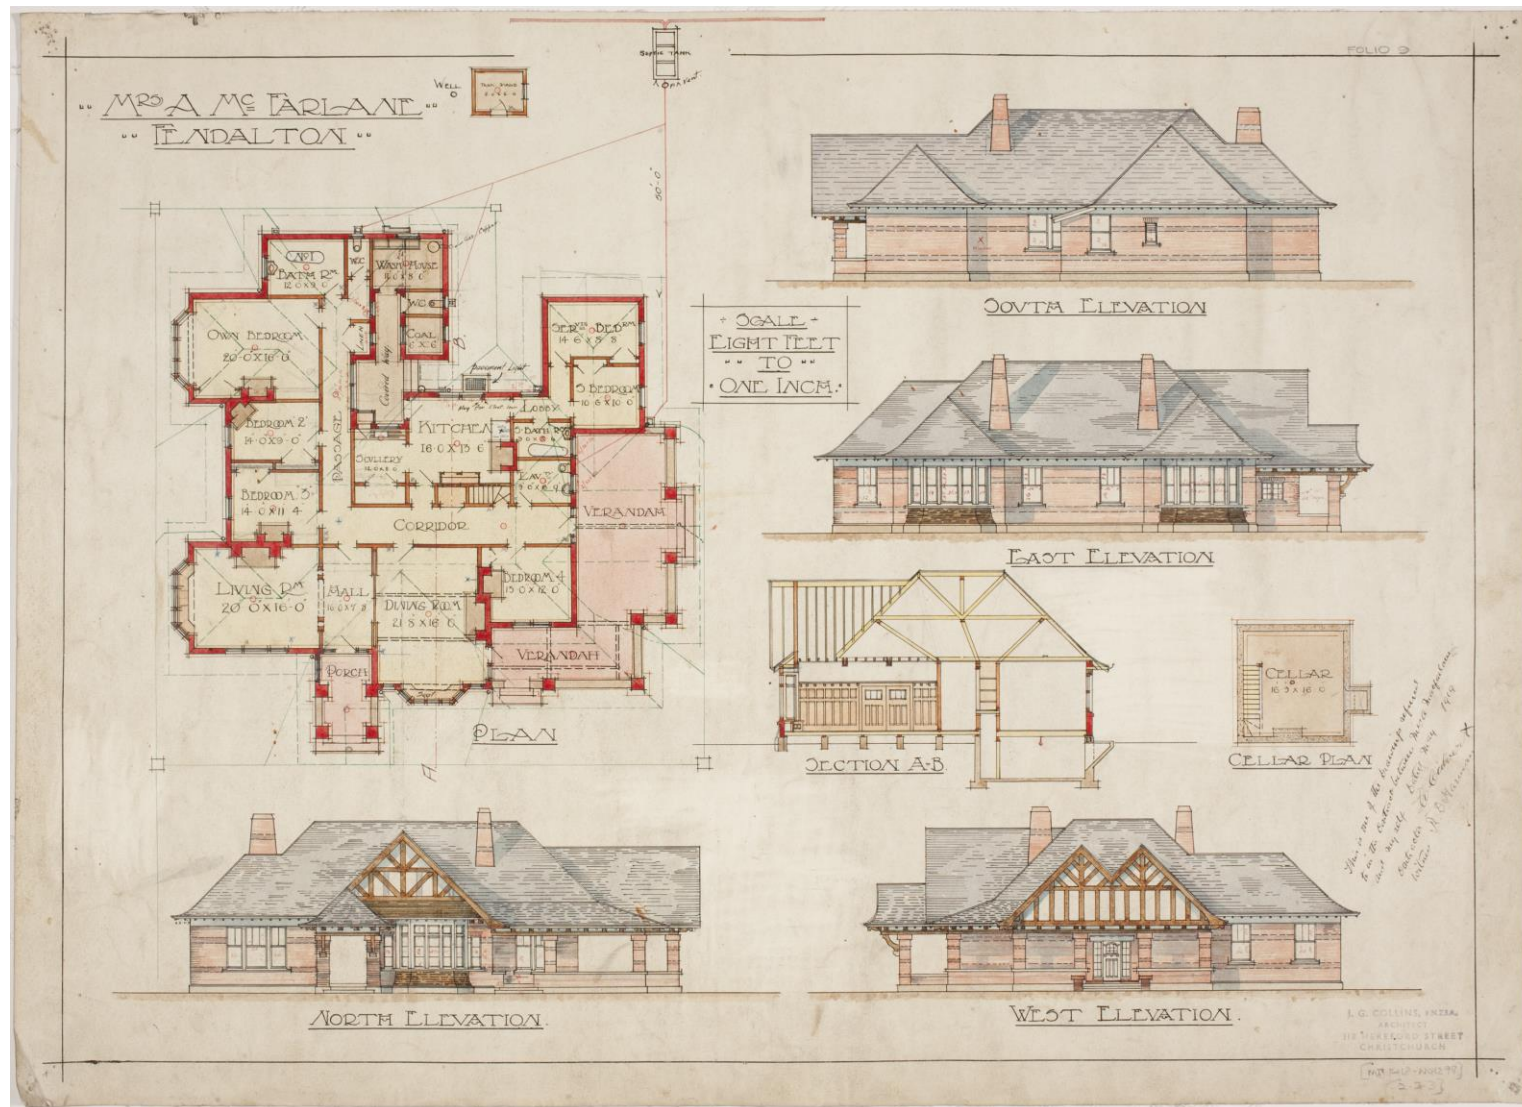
Collins and Harman, Mrs. A. McFarlane, Fendalton, plans, elevations and section (1919).
